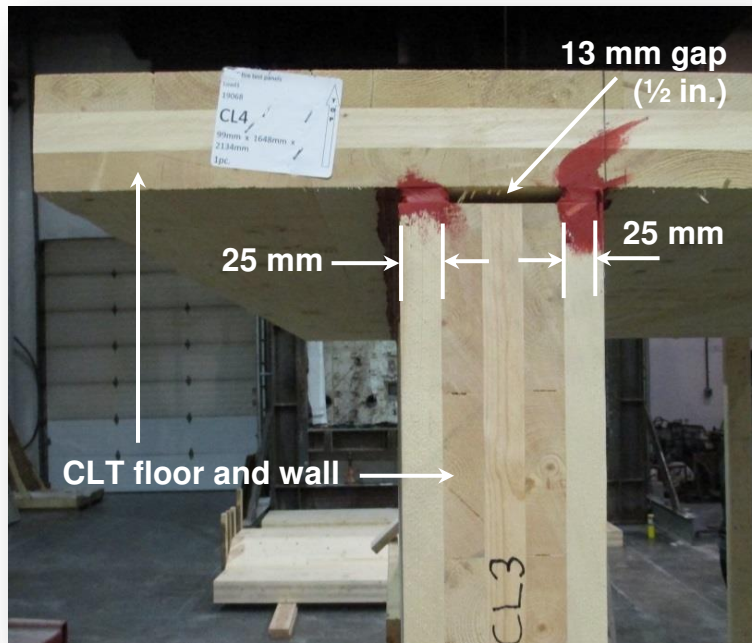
Horizontal linear joint No. 2 (Floor-to-Wall)
